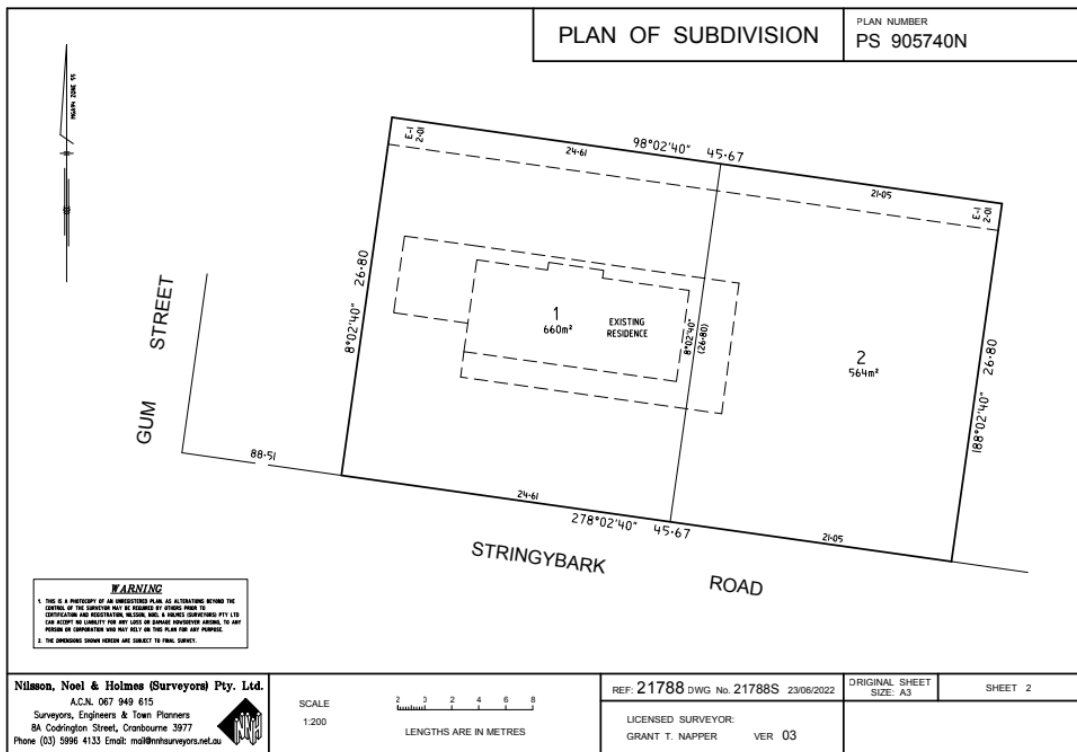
Proposed Plan of Subdivision. Source: Nilsson, Noel & Holmes Surveyors, 2022.
